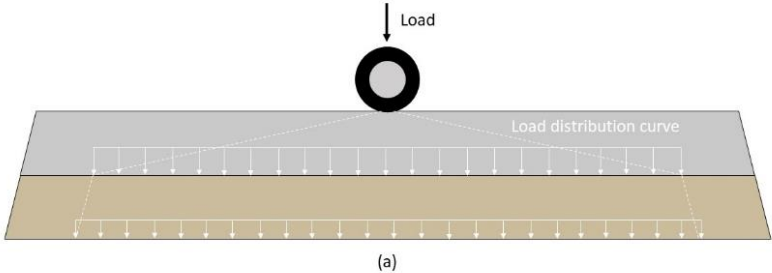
Rigid pavement load distribution (SANRAL, 2019)
